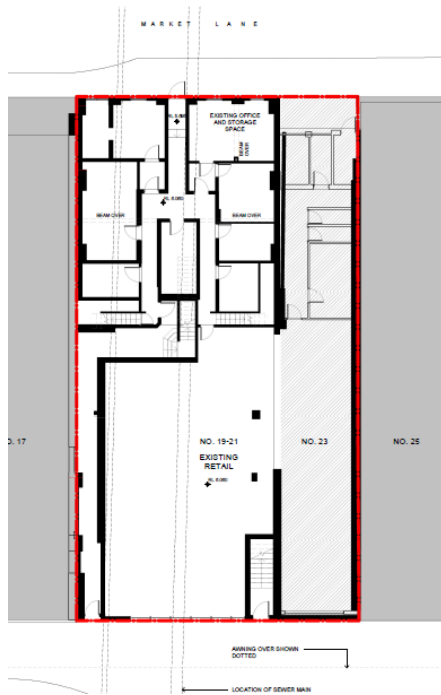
Existing Ground Floor Plan. (Source: NBRSEARCHITECTURE)
